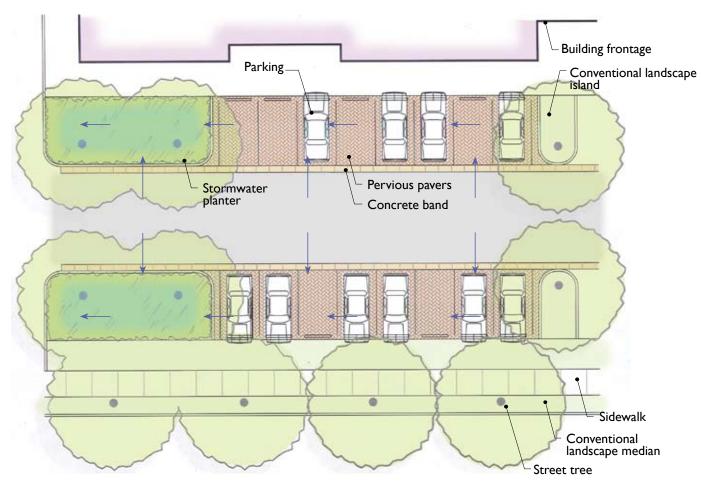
Parking Lot With Pervious Paving and Stormwater Planters-Plan View
